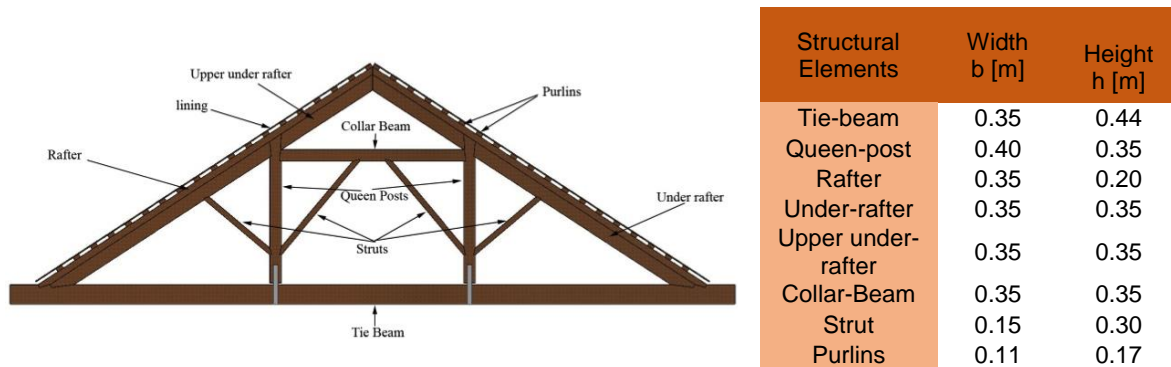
São Roque Church: truss with the terminology used on the present paper and sections of its elements.
